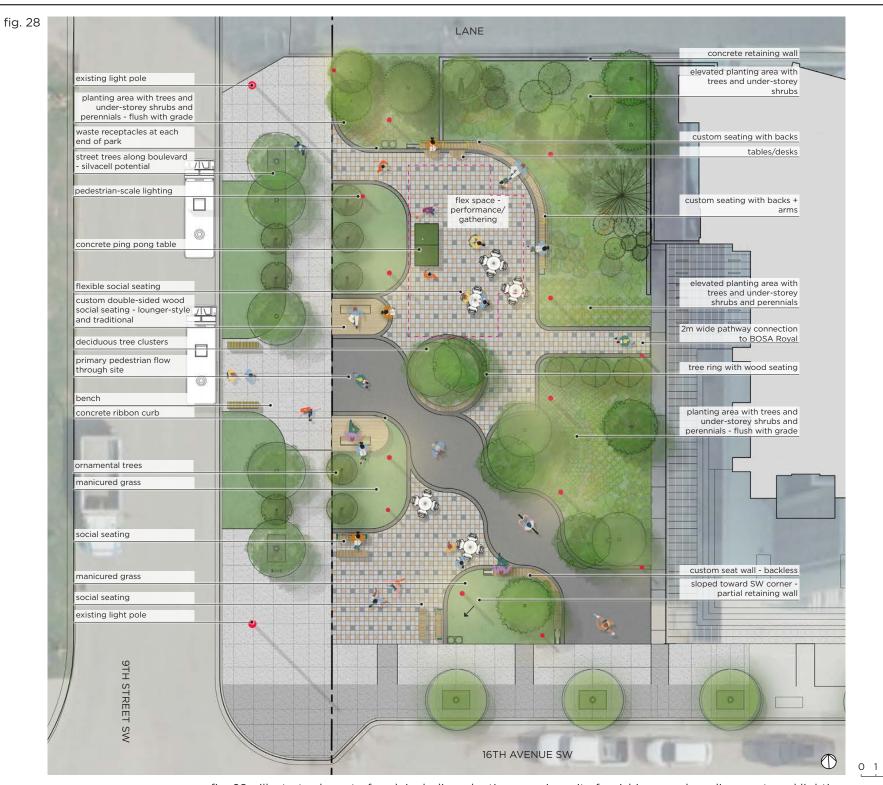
illustrates layout of park including plantings, paving, site furnishings, curb realignment, and lighting
